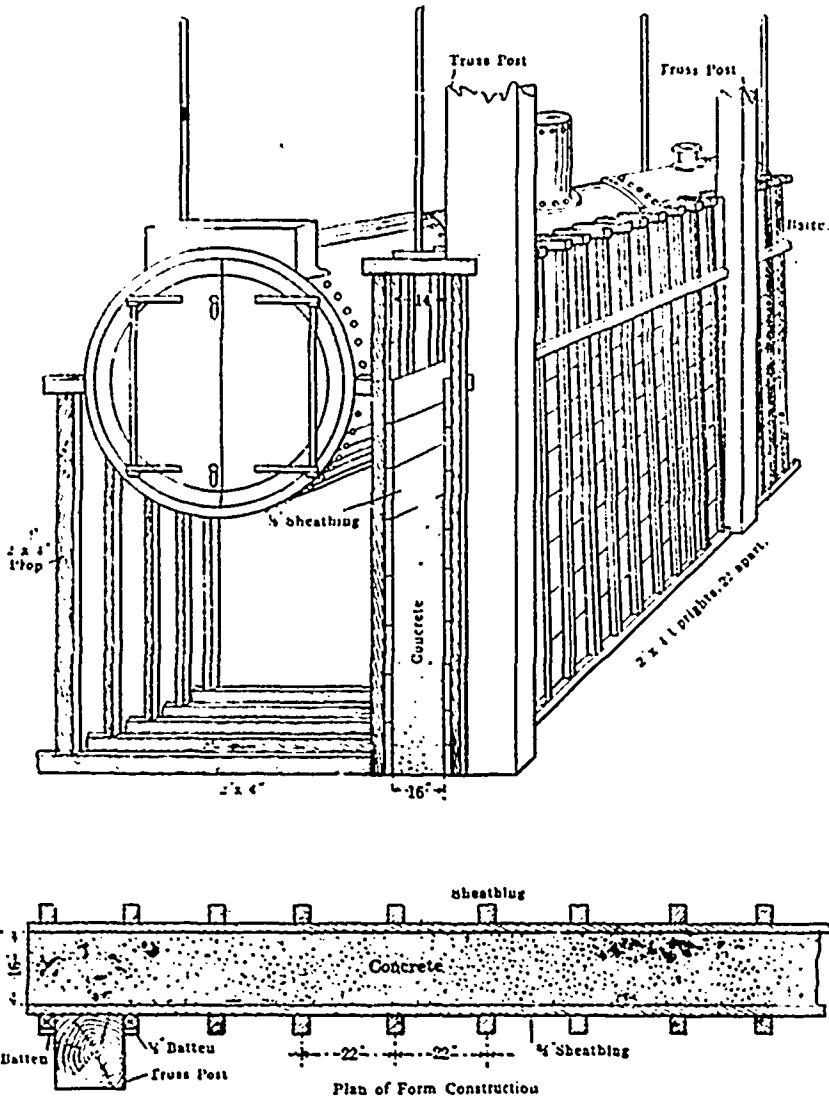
SHOWING CONCRETE-FORM CONSTRUCTION
